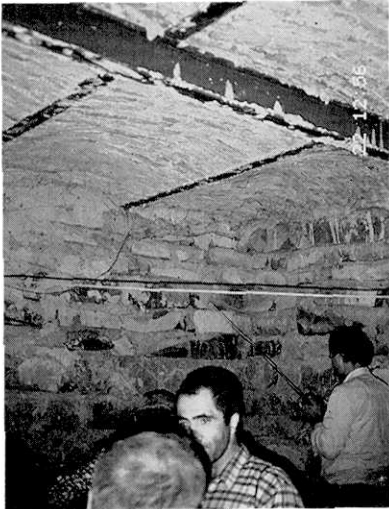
Dome brick roof without damage at the Jirandeh Seismic Station. One of the earthquake resistant structures in Iran.
